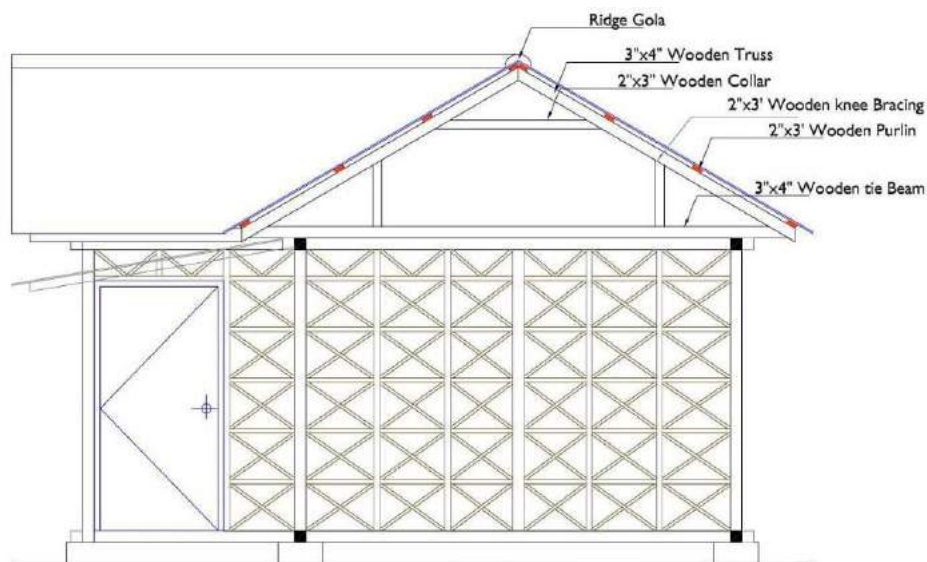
Typical side elevation of an “engineered” dhajji dewari building after the 2005 Pakistan earthquake
